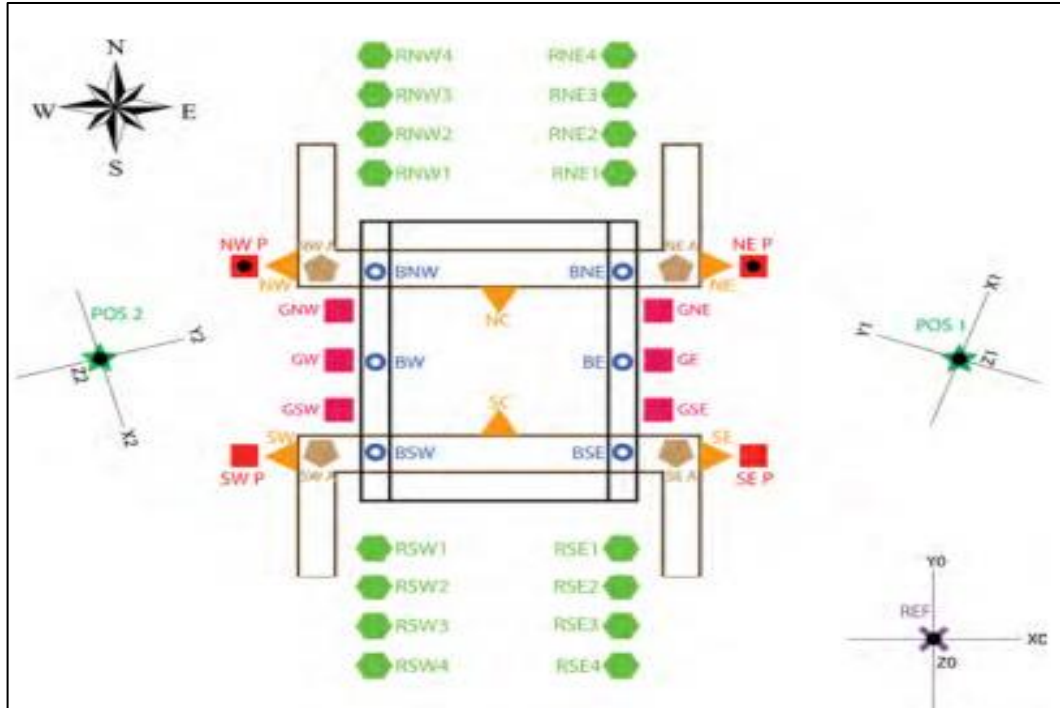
Locations of survey points on the STH 40 over Hey Creek Bridge in Wisconsin (Garnier-Villarreal et al. 2014)
